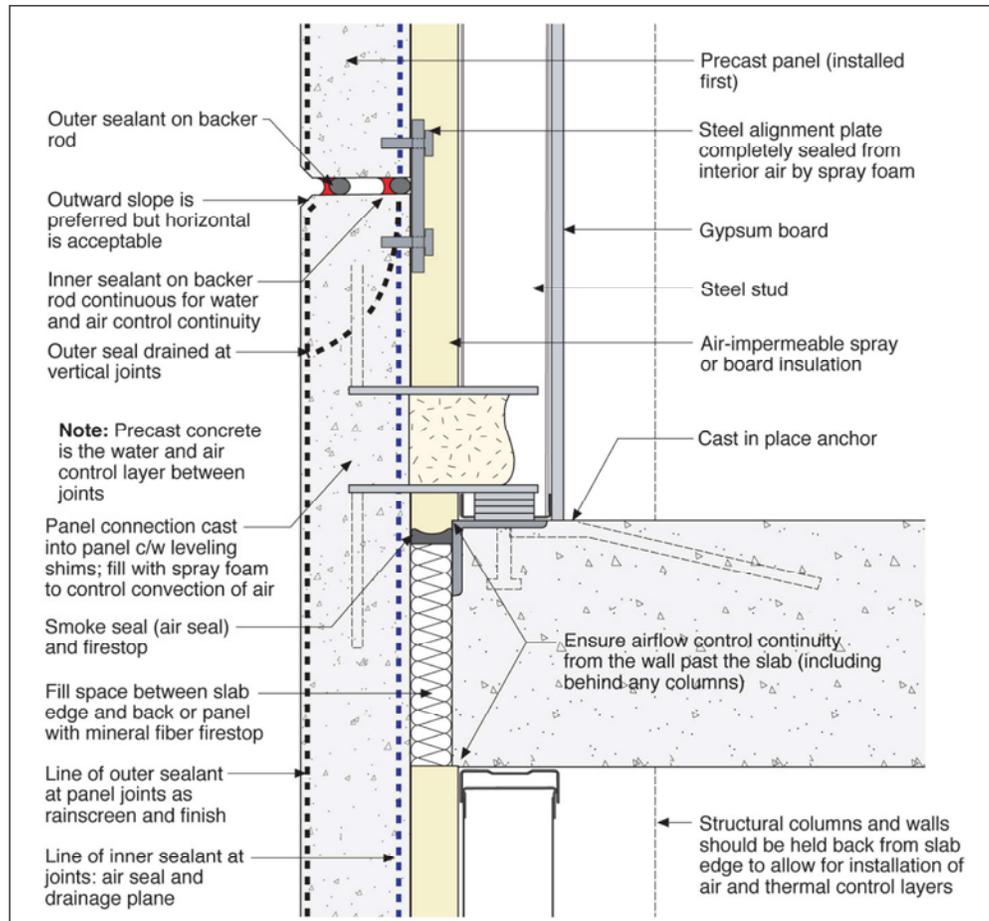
Single wythe (architectural) precast concrete wall panel assembly at slab edge. Image copyright RDH Building Science Inc., used with permission
